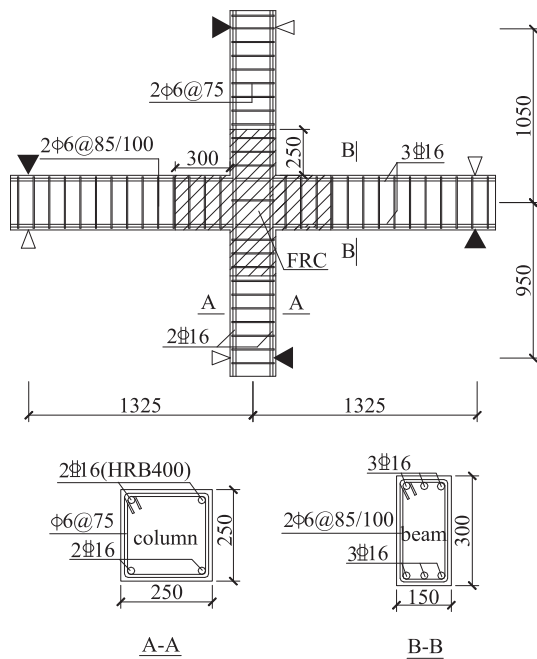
Geometry and reinforcement configuration of specimens (except for RCJ1 where no FRC is used) (units: mm).
